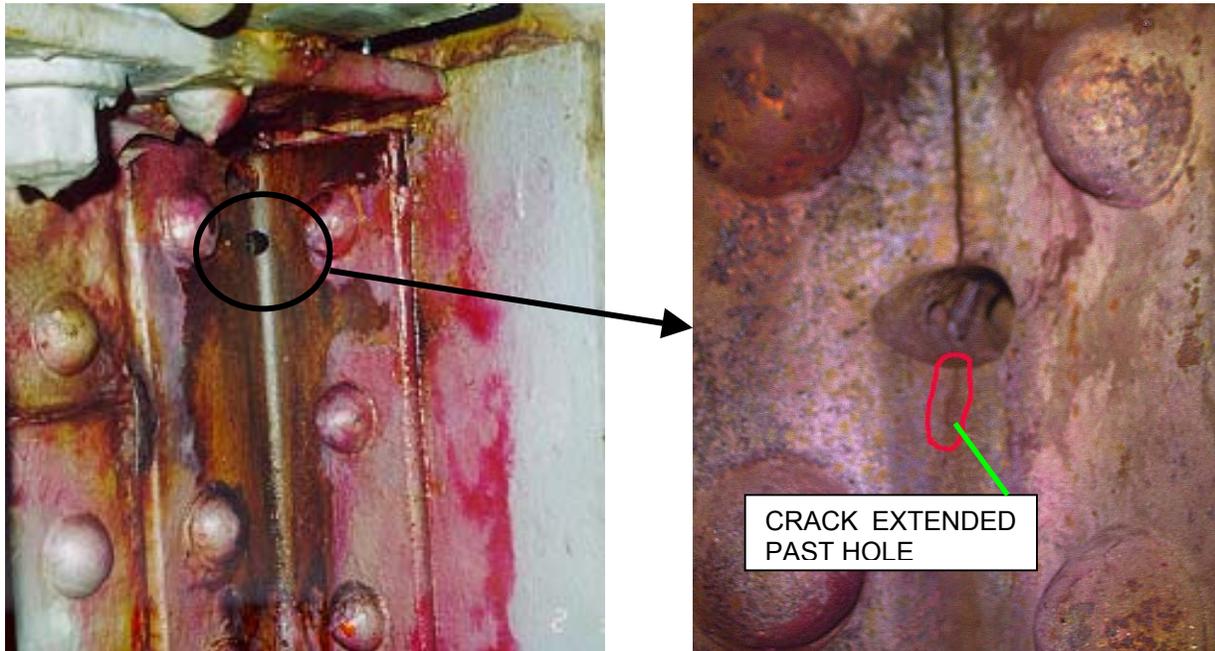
Crack in bridge floorbeam connection angle
